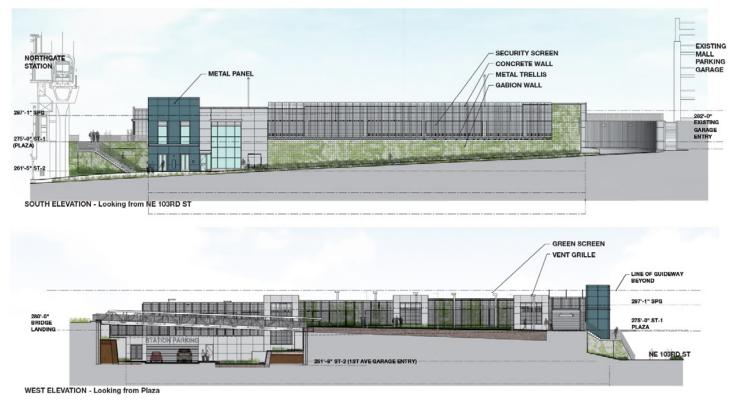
South (top) and west (bottom) elevation section of proposed parking garage
